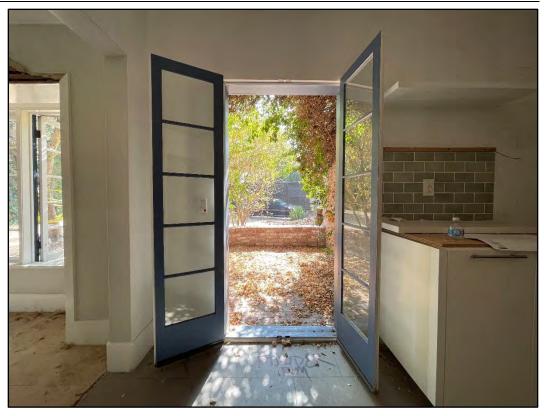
Interior view of the southwest French doors, facing the patio and looking west.
